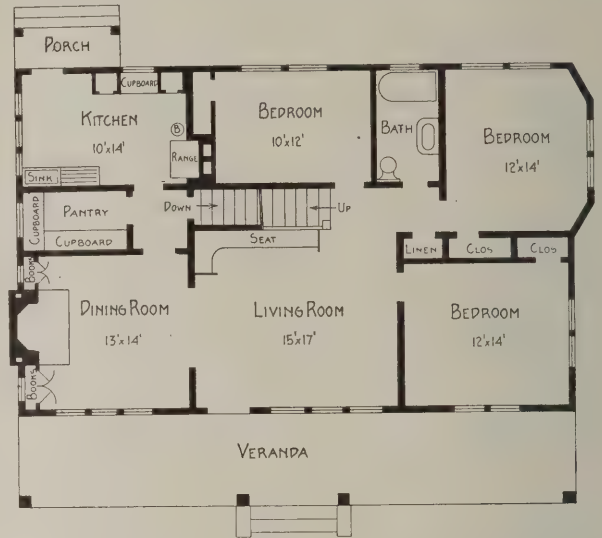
A Well Arranged Plan for a 1½-Story Bungalow
